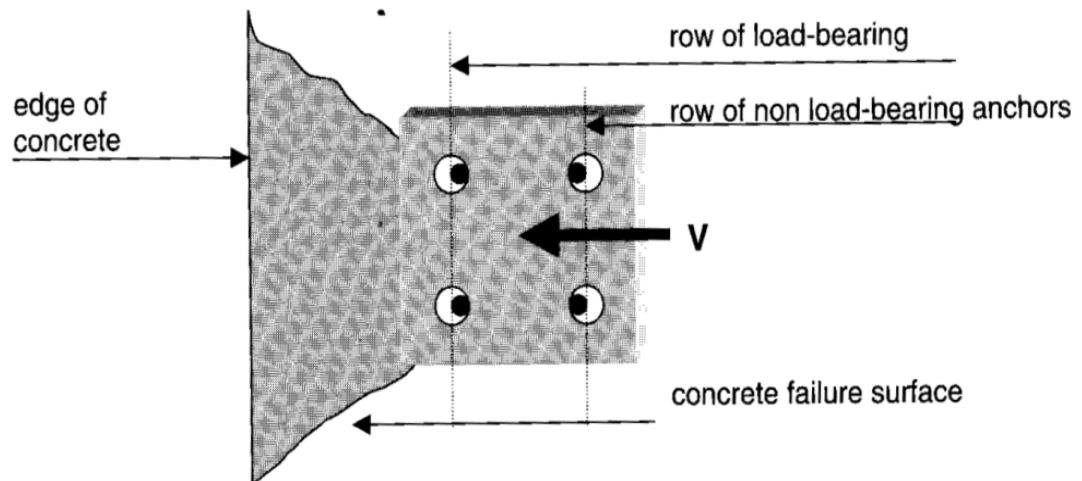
Row of load-bearing anchor bolts closer to concrete edge [139].
